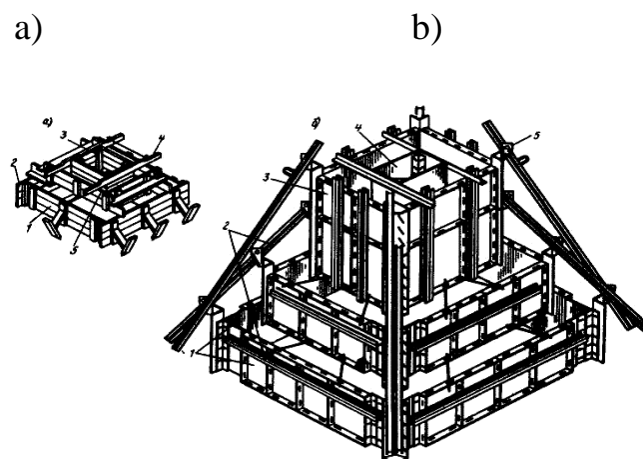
Panel formwork for stepped glass-type foundations for columns:
